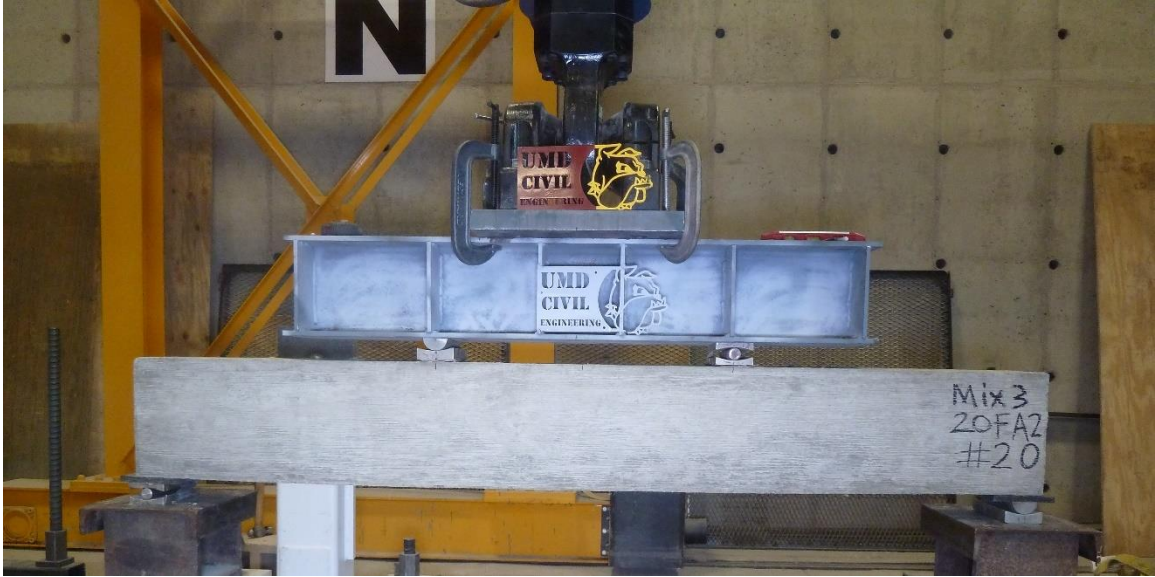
Mixture 3 (20FA2) beam #20: concrete beam before testing.
